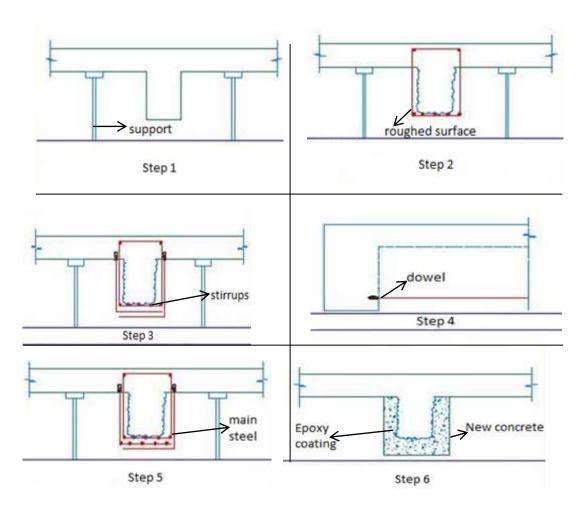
Steps in section enlargement of beam (The Constructor, Civil Engineering Home, 2013)
